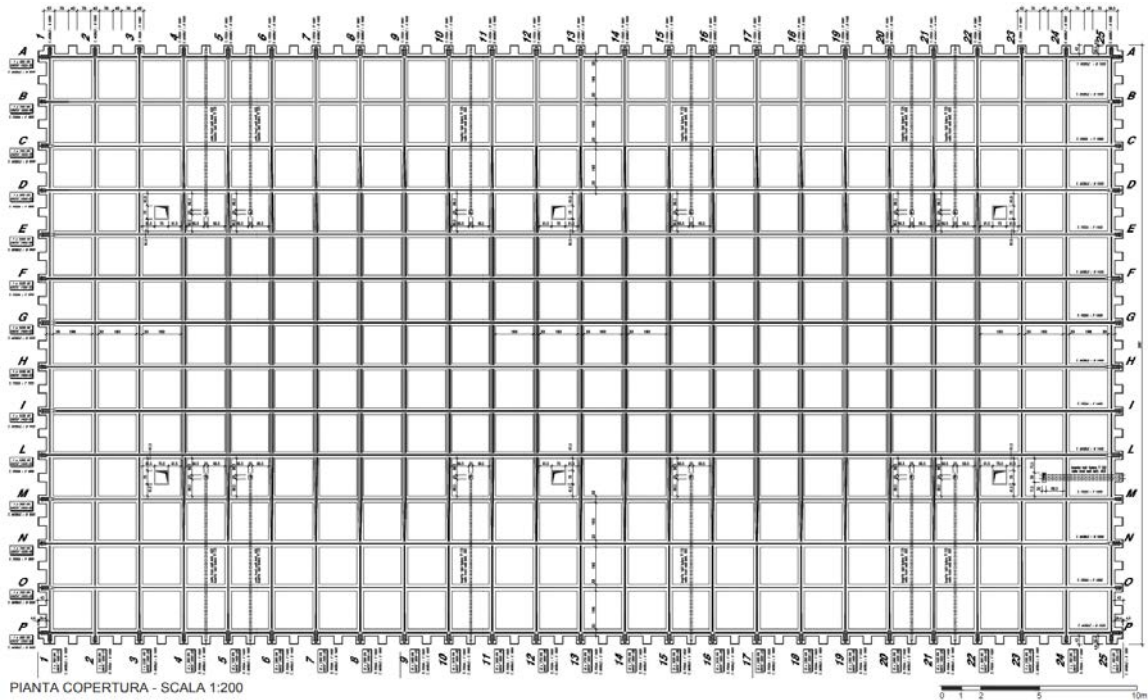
Structural plan of the roof of the gymnasium in Losone. (Drawing by Andreotti & Partners, Locarno)
